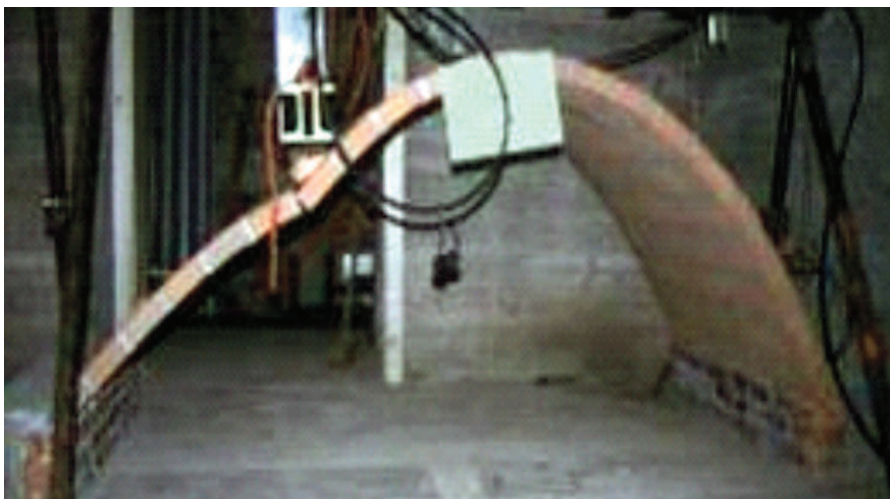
Collapse mechanism of a vault strengthened using CFRP strips; [10]
